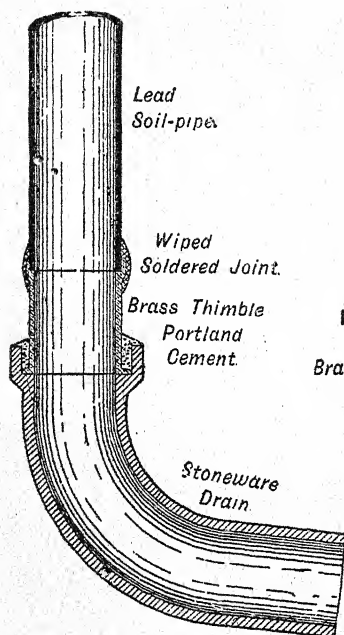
Lead Soil-pipe Jointed to Stoneware Drain.
